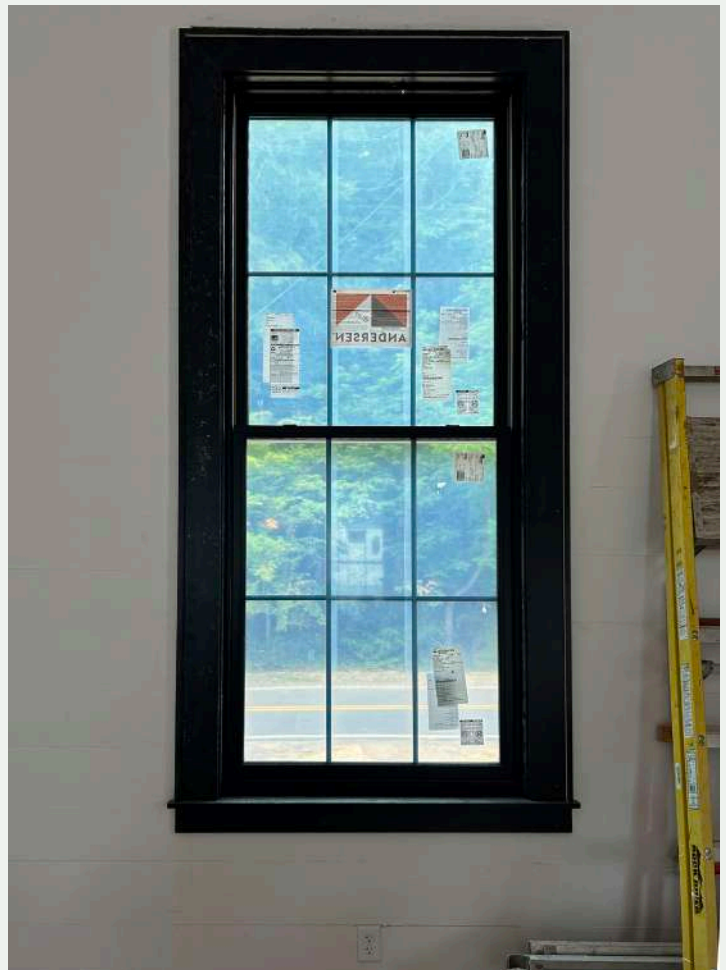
In June 2025, church members installed new six-over-six vinyl replacement windows, matching the design of the historic wood windows.
